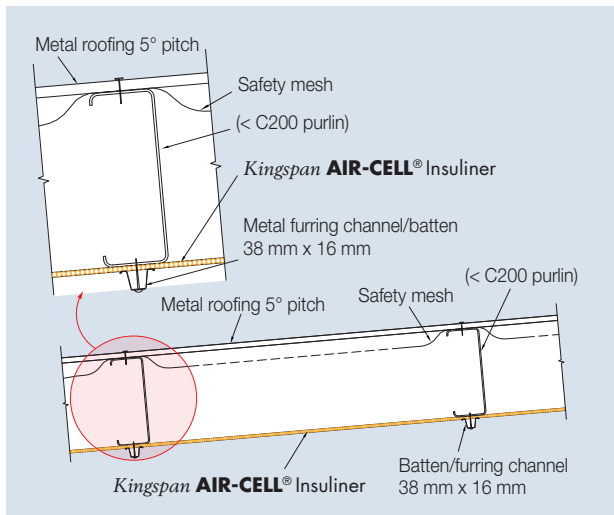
Side elevation of Kingspan AIR-CELL Insuliner® in a warehouse metal deck roof retrofit
